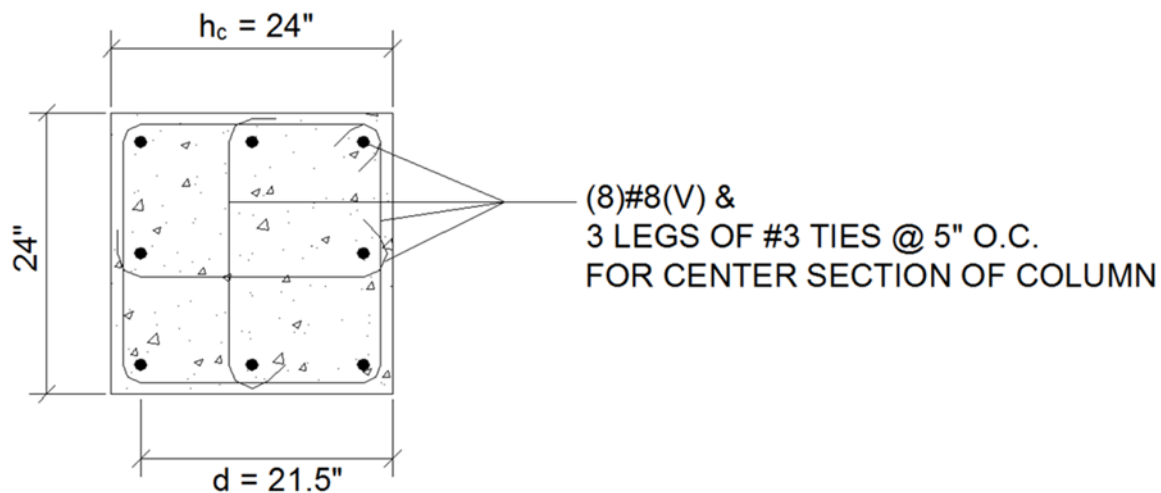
Interior column, center section cross-section for of column at all floor levels based on SDC D design.
